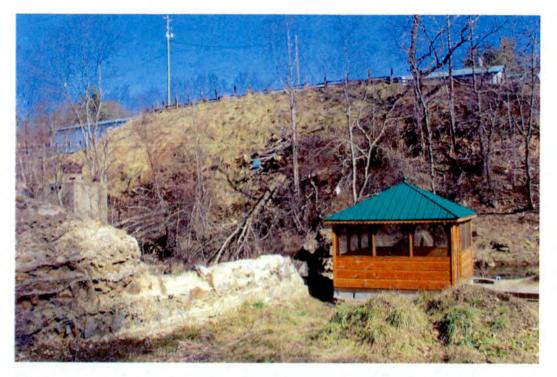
North bank of the Little River showing remnants of dam wall and poured concrete wall.
